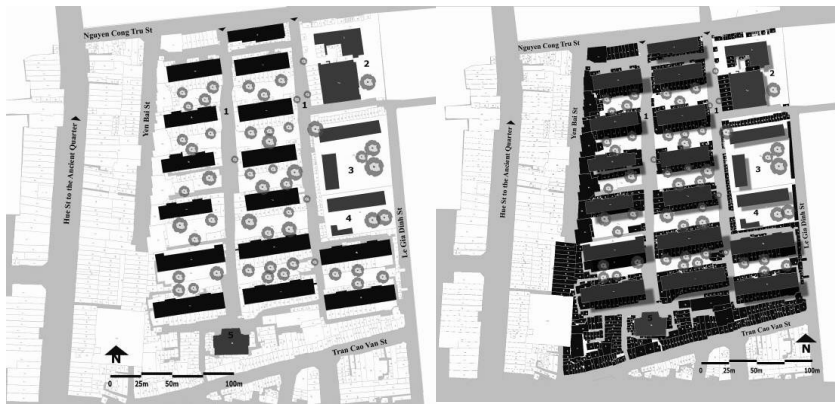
Left: Original plan of KTT Nguyen Cong Tru. Right: Contemporary plan showing additional structures built onto the apartment blocks and into open space.<sup>10</sup>
